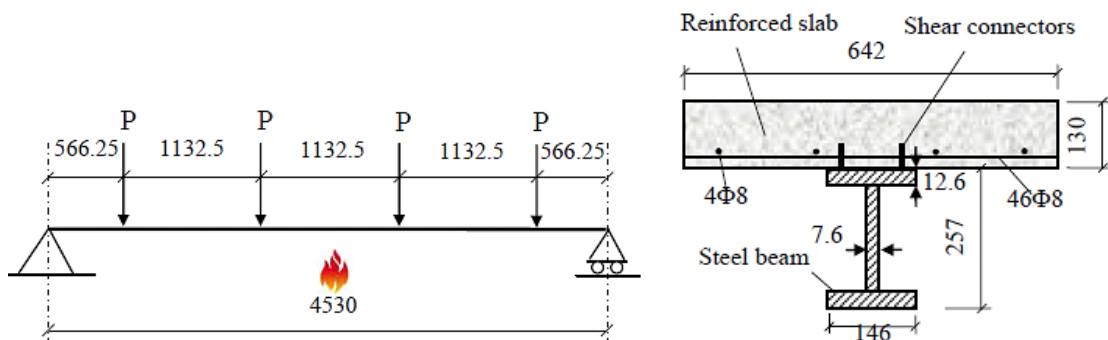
Longitudinal section and cross-section of the beam from Jiang et al. (2015).
